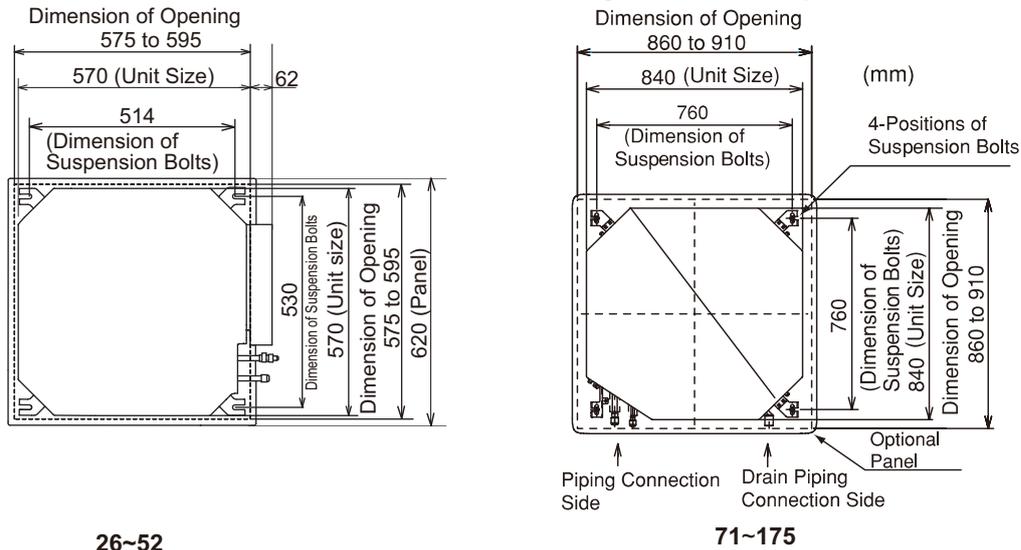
Opening of False Ceiling and Suspension Bolts
